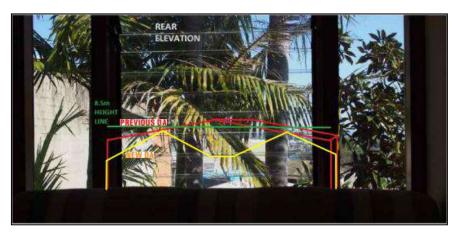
View from Ground Level Living Room (No. 95 Union Street)
